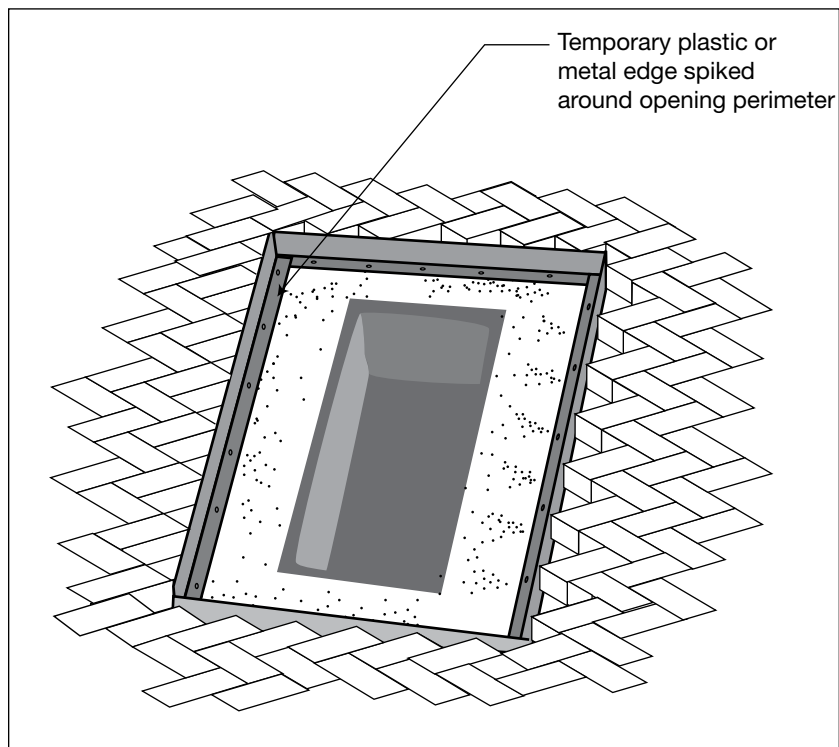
Temporary bracing at the pavement opening will help keep units in place during excavation, repairs and reinstatement.
